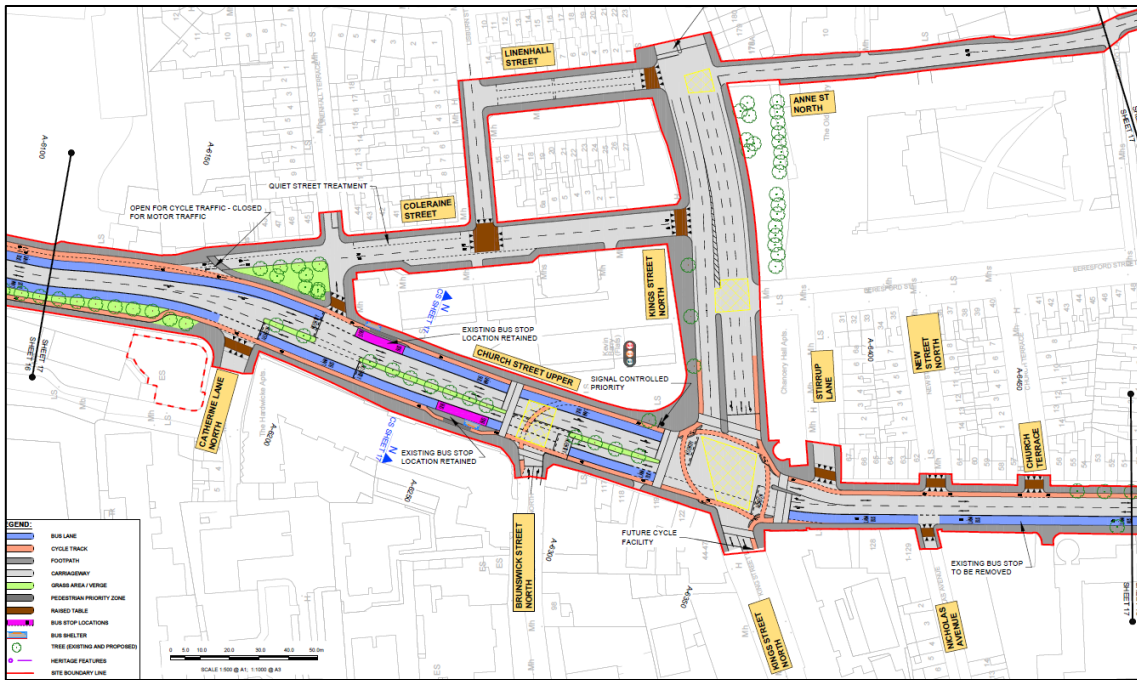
Extract from General Arrangement Drawing Sheet 17
